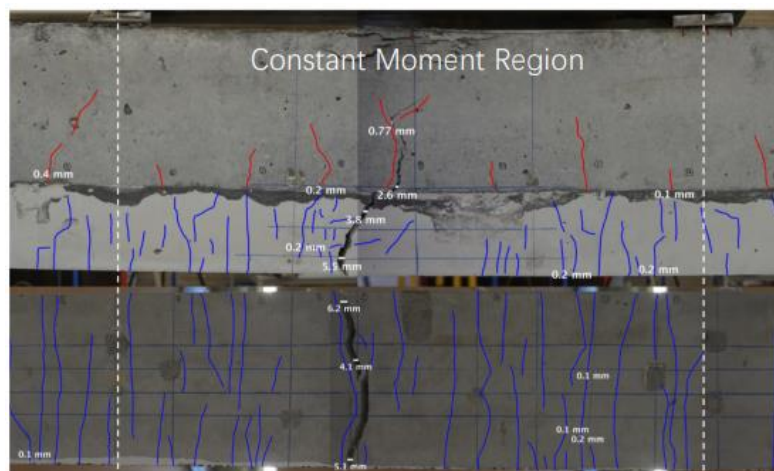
Cracking pattern during testing (side view and bottom view)
